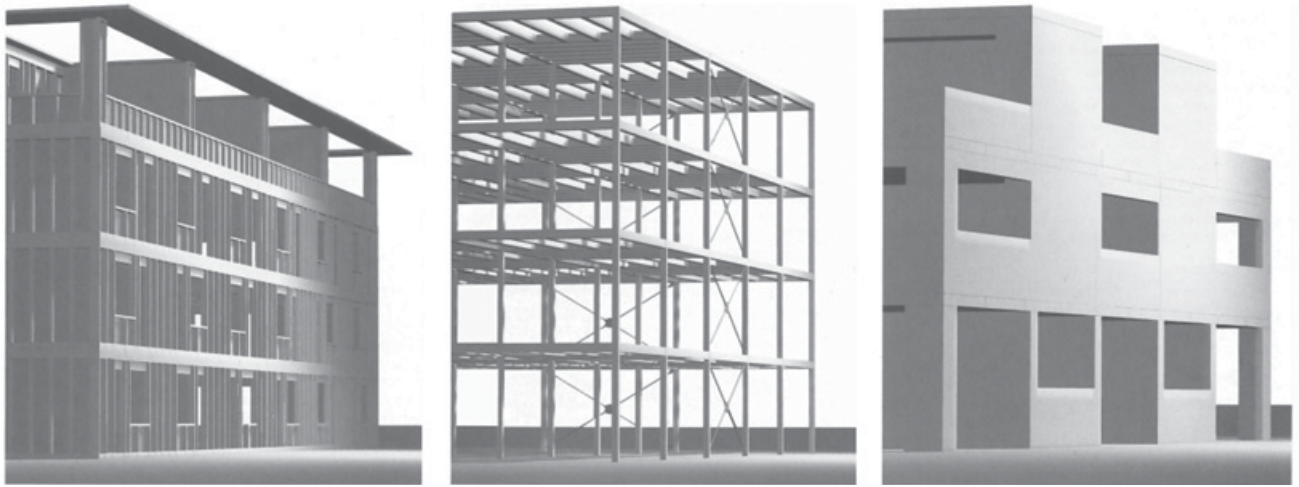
WOOD-BASE BUILDING CONSTRUCTION SYSTEMS
